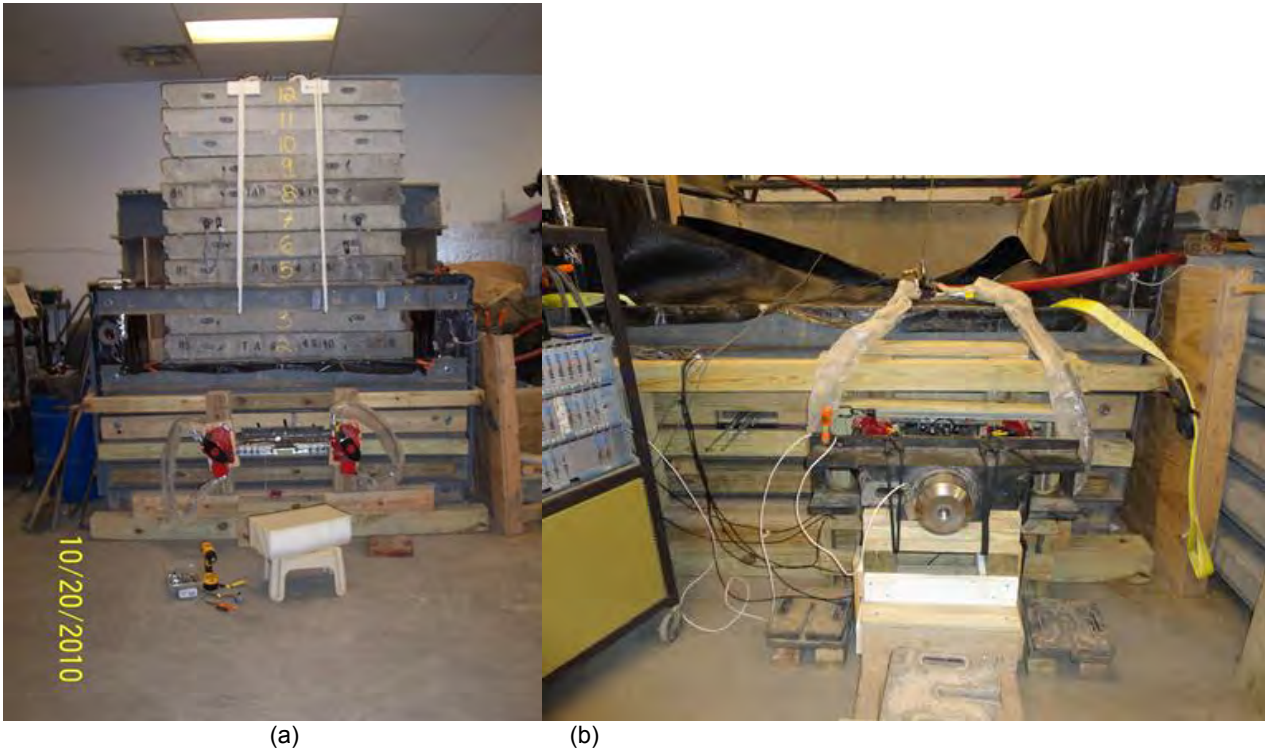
Full-scale confined connection laboratory test setup for (a) Loop-Crimp connection test with high overburden pressure of 73 kN/m^2 (1525 psf) and (b) DPS-TAB connection test with low overburden pressure of 6.7 kN/m^2 (140 psf).
